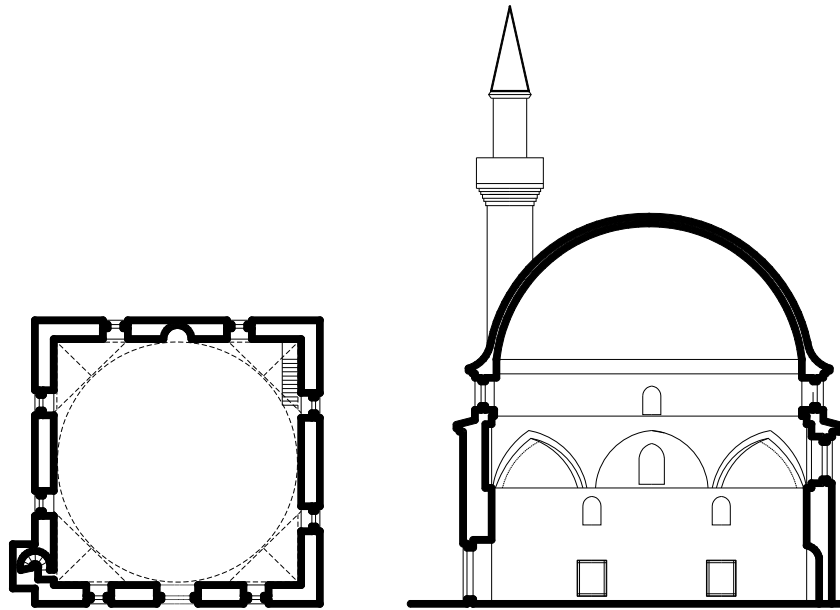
Plan (left) and section (right) of the Orhan Gazi Mosque.
